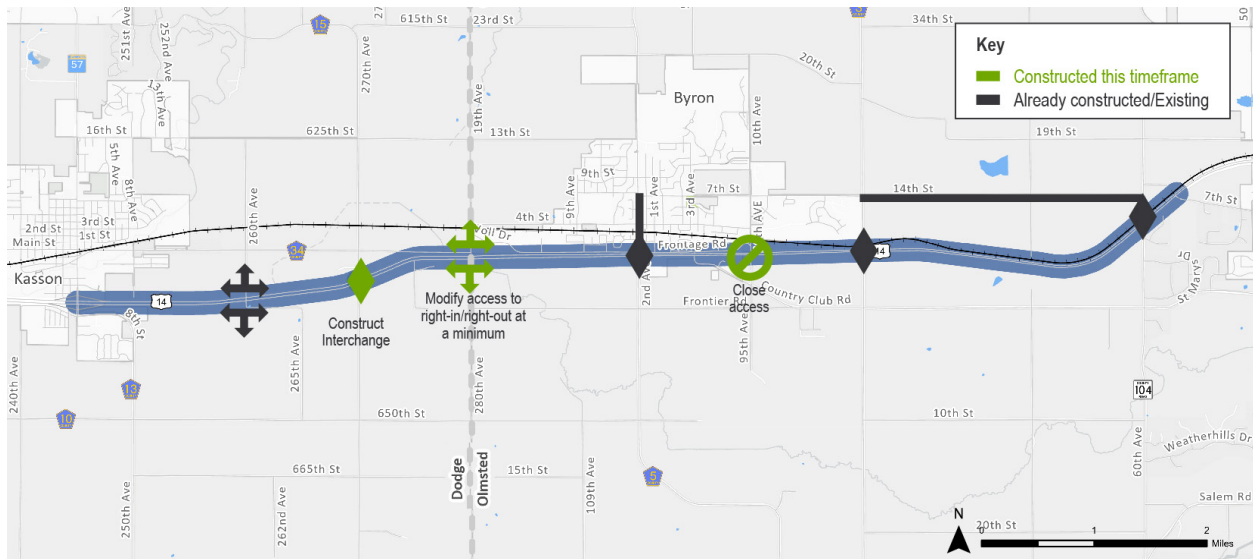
Implementation Plan CSAH 3 Constructed First – Long-Term, Stage 1
